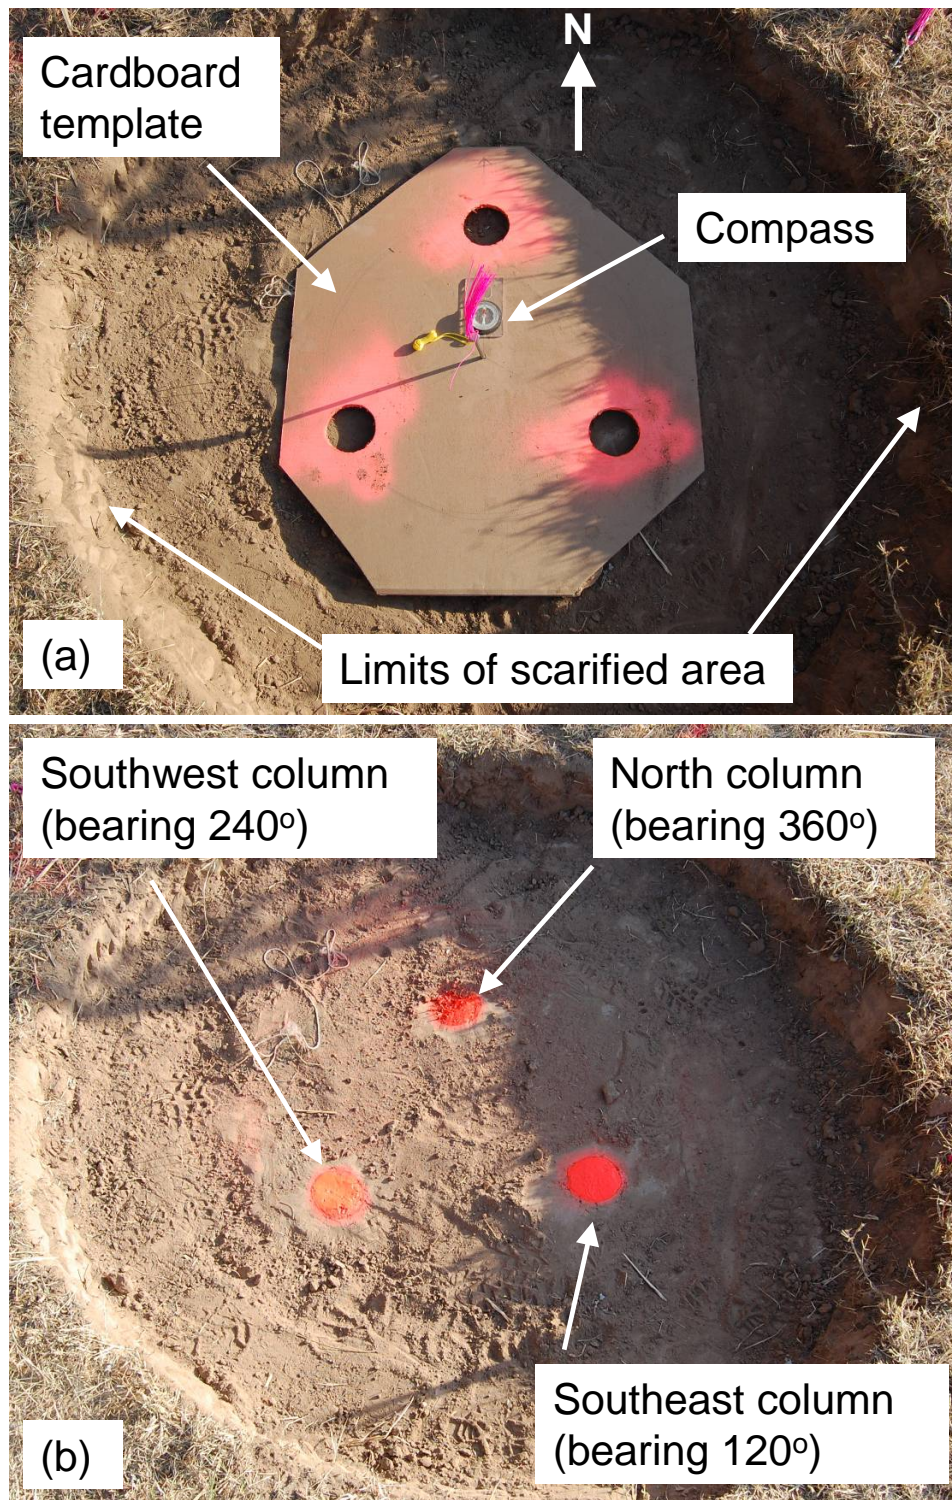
Marking the sensor column locations at Site 2: (a) orienting the columns using a cardboard template and (b) column nomenclature and azimuth
